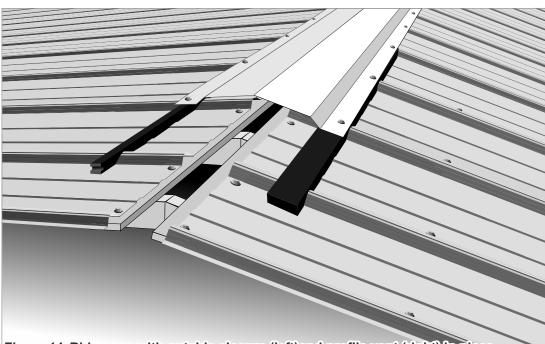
Ridge cap with outside closure (left)and profile vent (right) in place
